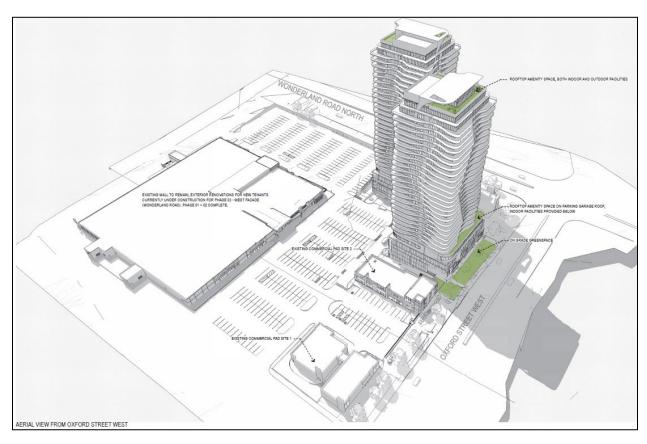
Rendering 530 Oxford Steet West - Aerial View from Oxford & Wonderland looking west
